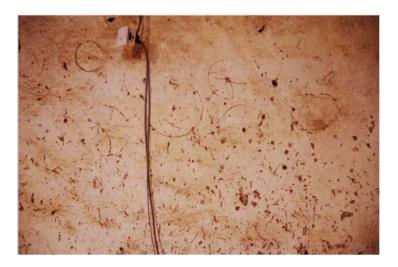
Detail of marks at east end of north elevation, looking north-northwest
